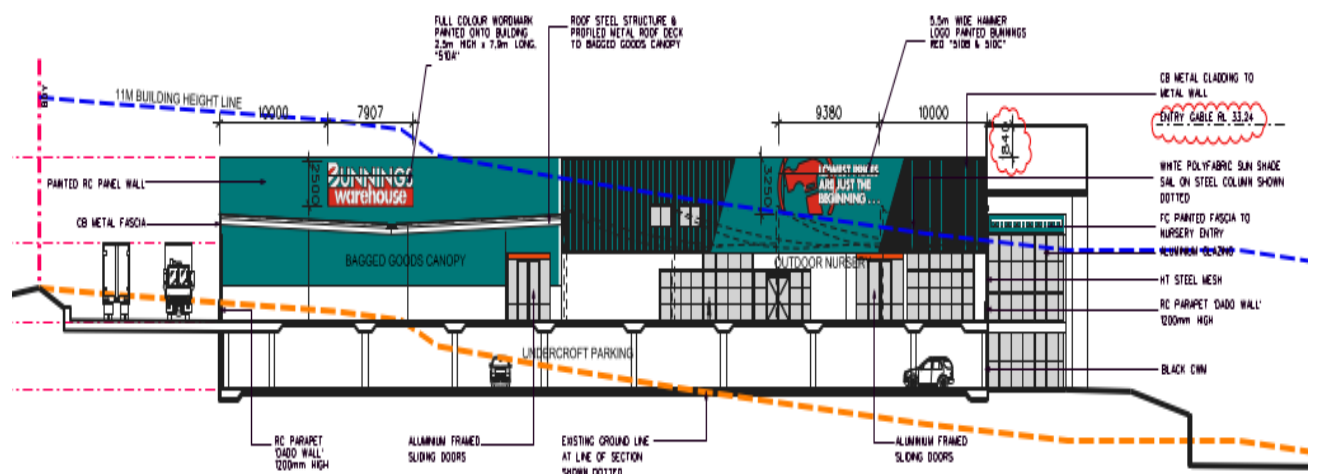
Eastern elevation of the proposed hardware and building supplies building.
